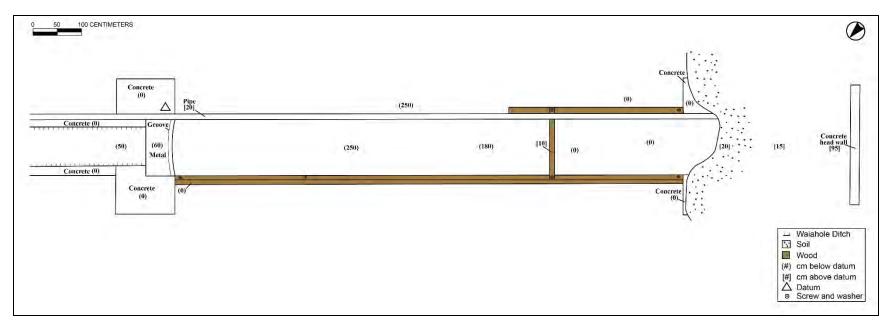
Plan map of SIHP # 50-80-08-2268 Feature I, showing portion of the Waiahole Ditch, collapsed bridge components, and head wall
